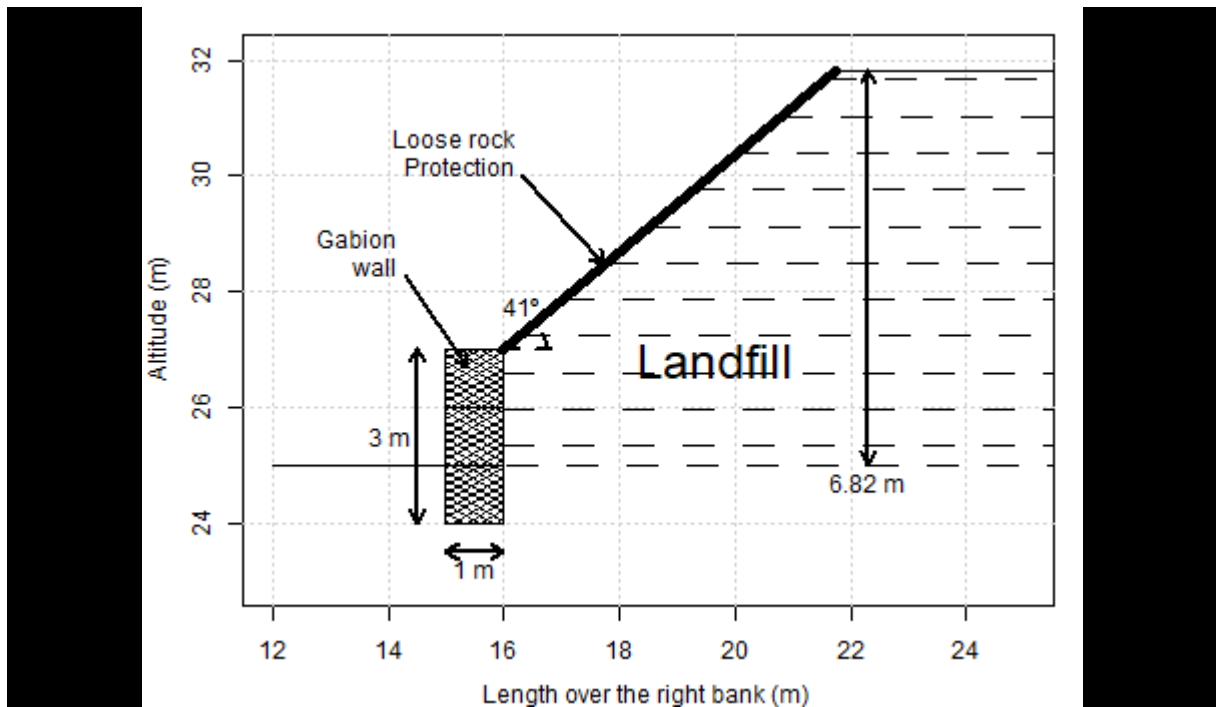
Schematic cross-section of the retention wall and the embankment.
